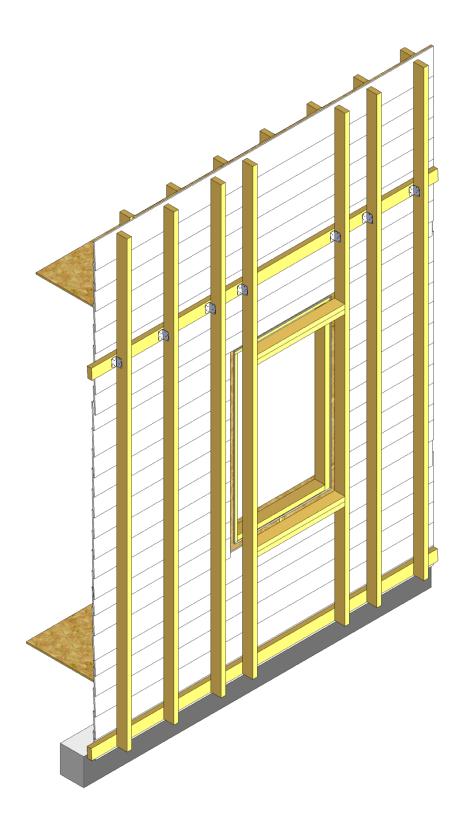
Step 5: Install two horizontal framing members on the top and bottom of the rough opening for the new window. Slightly slope the sill framing to the exterior.
